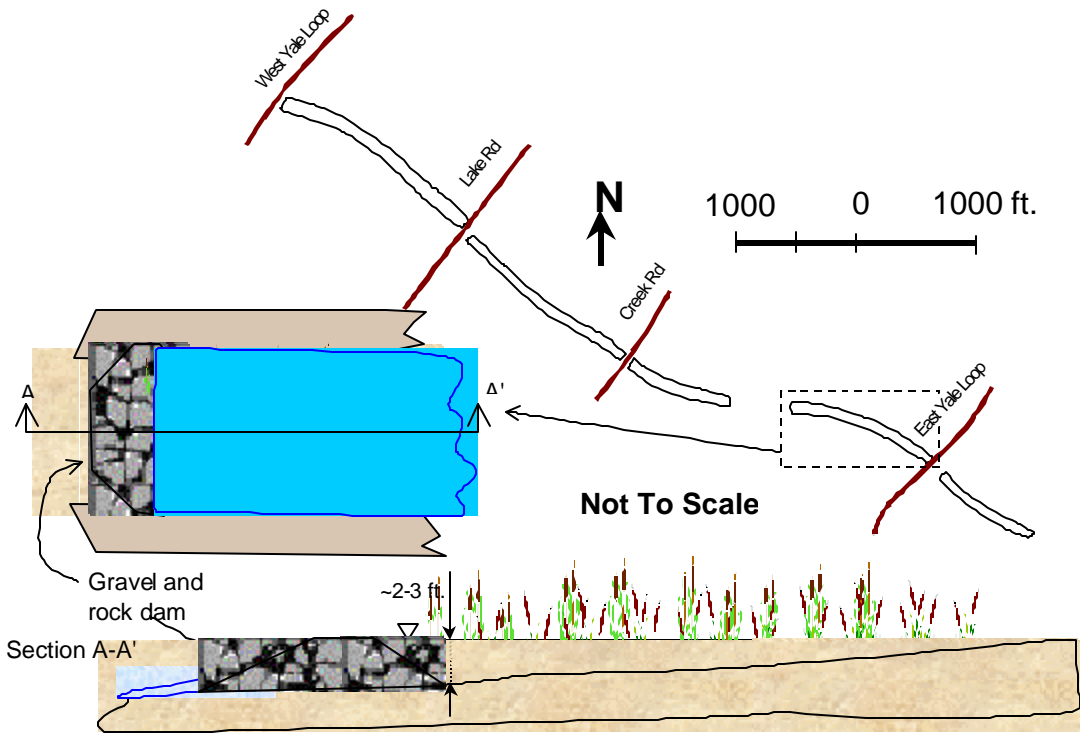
Conceptual Drawing of In-line Facility, showing a plan view along with cross-sections of the planned gravel and rock dams (2 to 3 feet in height).
